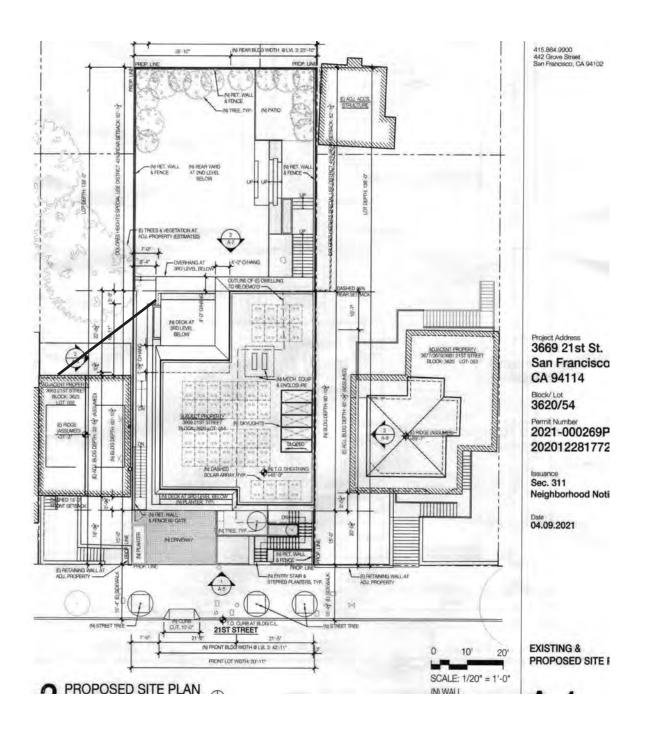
, detail of 3669 21st Street proposed site plan, sheet A-1, line superimposed showing view from rear deck to my property windows, at left
